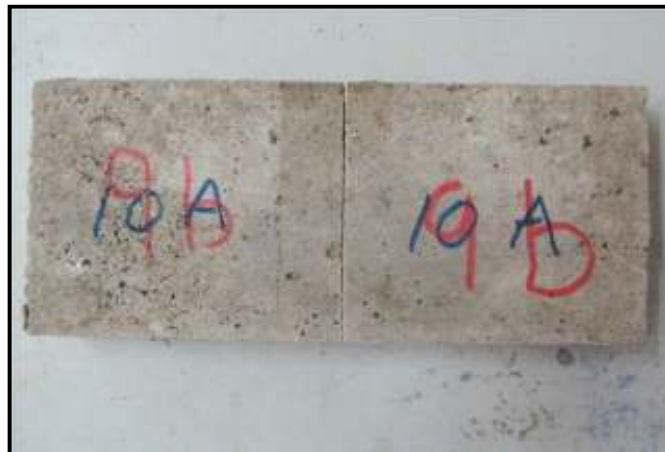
Typical appearance of specimen without mesh reinforcement after test
